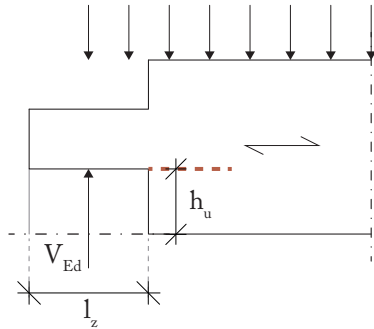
Shear and tension failure perpendicular to the grain at the notch corner for the joist.
